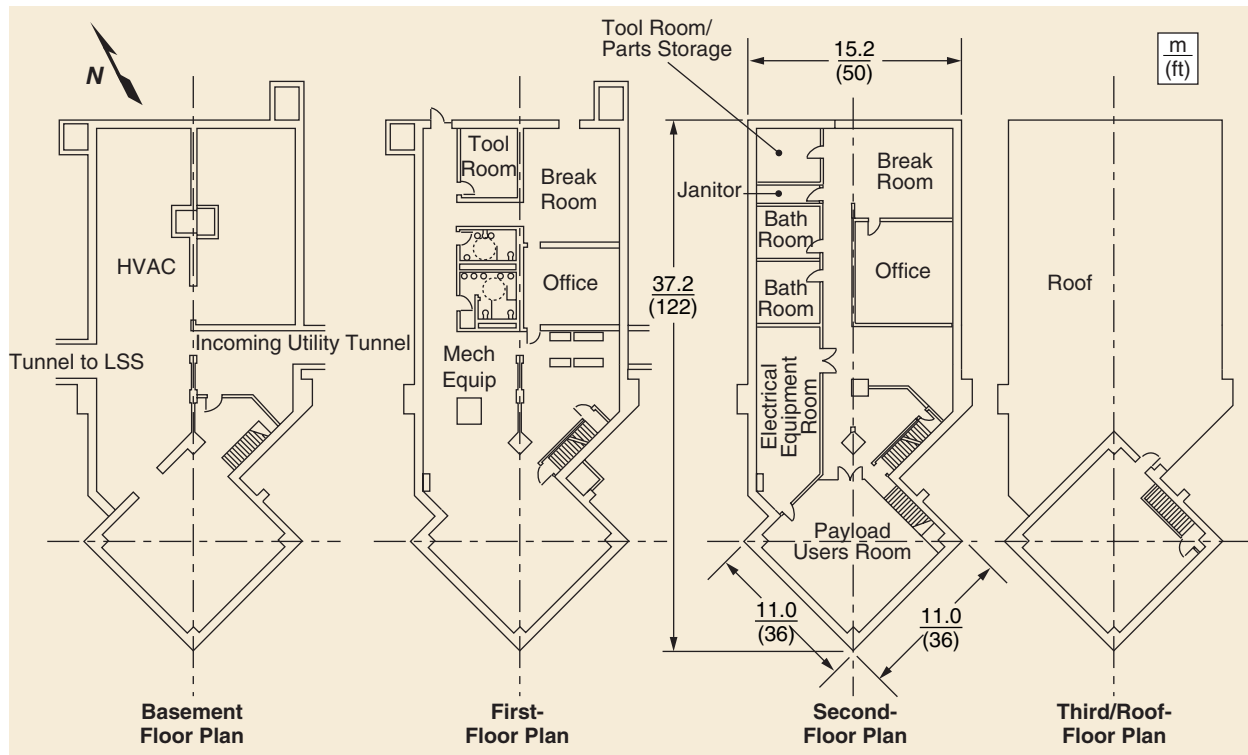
Space Launch Complex 37 Common Support Building (CSB) Sample Layout
